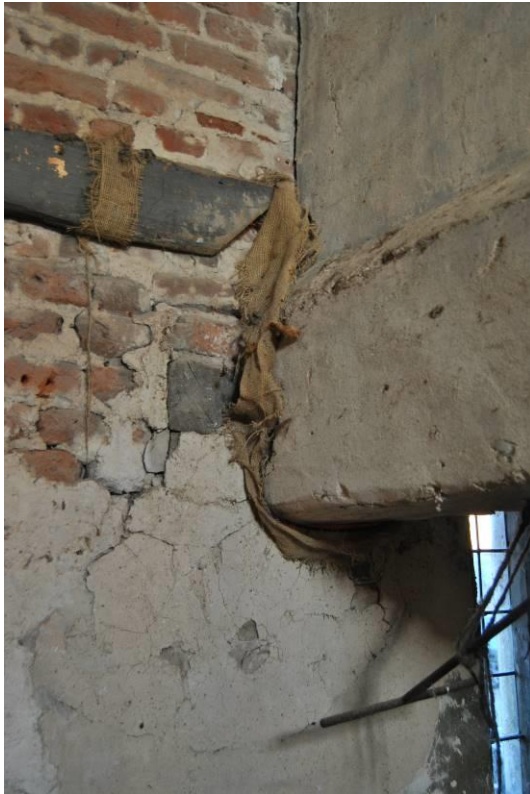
Evidence for insertion of first floor transverse beam supporting west wall of 'gardener's flat'.
